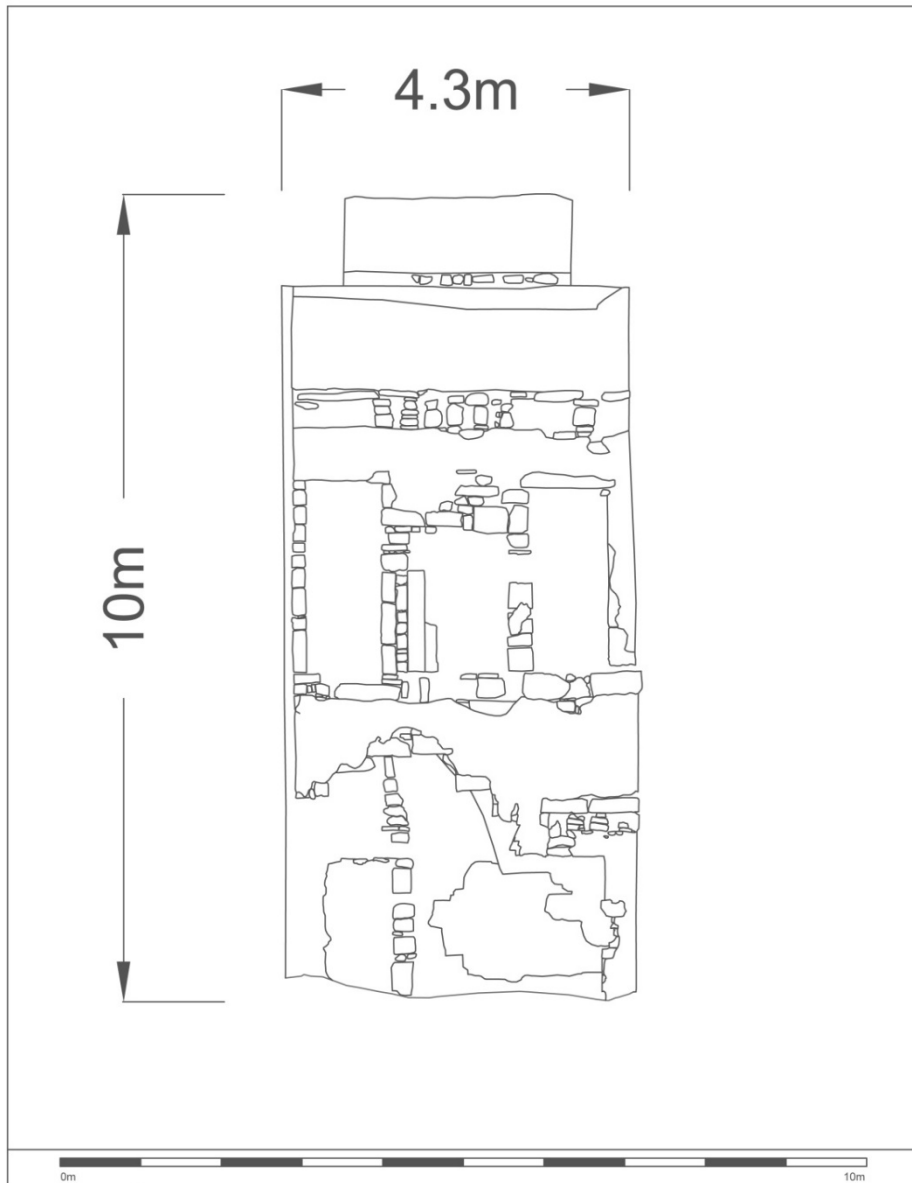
Internal elevation of the north-east wall of the signal tower at Inisheer Signal Station.
